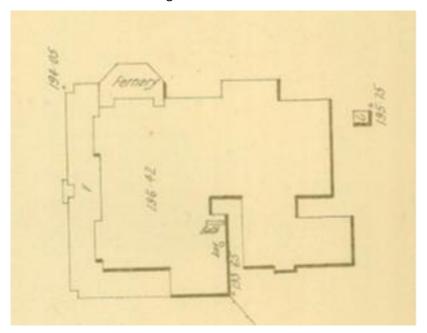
The footprint of the newly constructed house, as evident on the 1902 MMBW detail plan. The remainder of the property remained vacant land.
